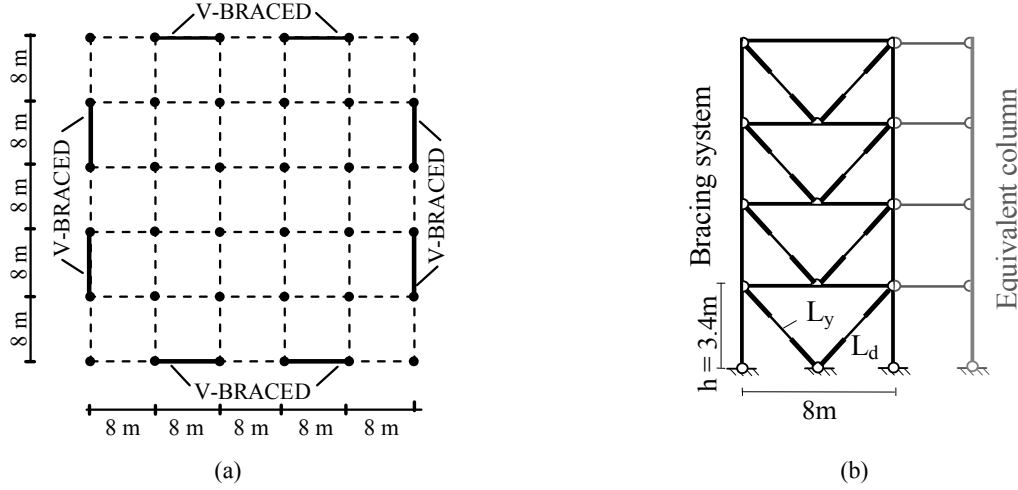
Case study: (a) floor configuration with arrangement of bracing system; (b) simplified planar model of the bracing system (bracing system and equivalent column).
